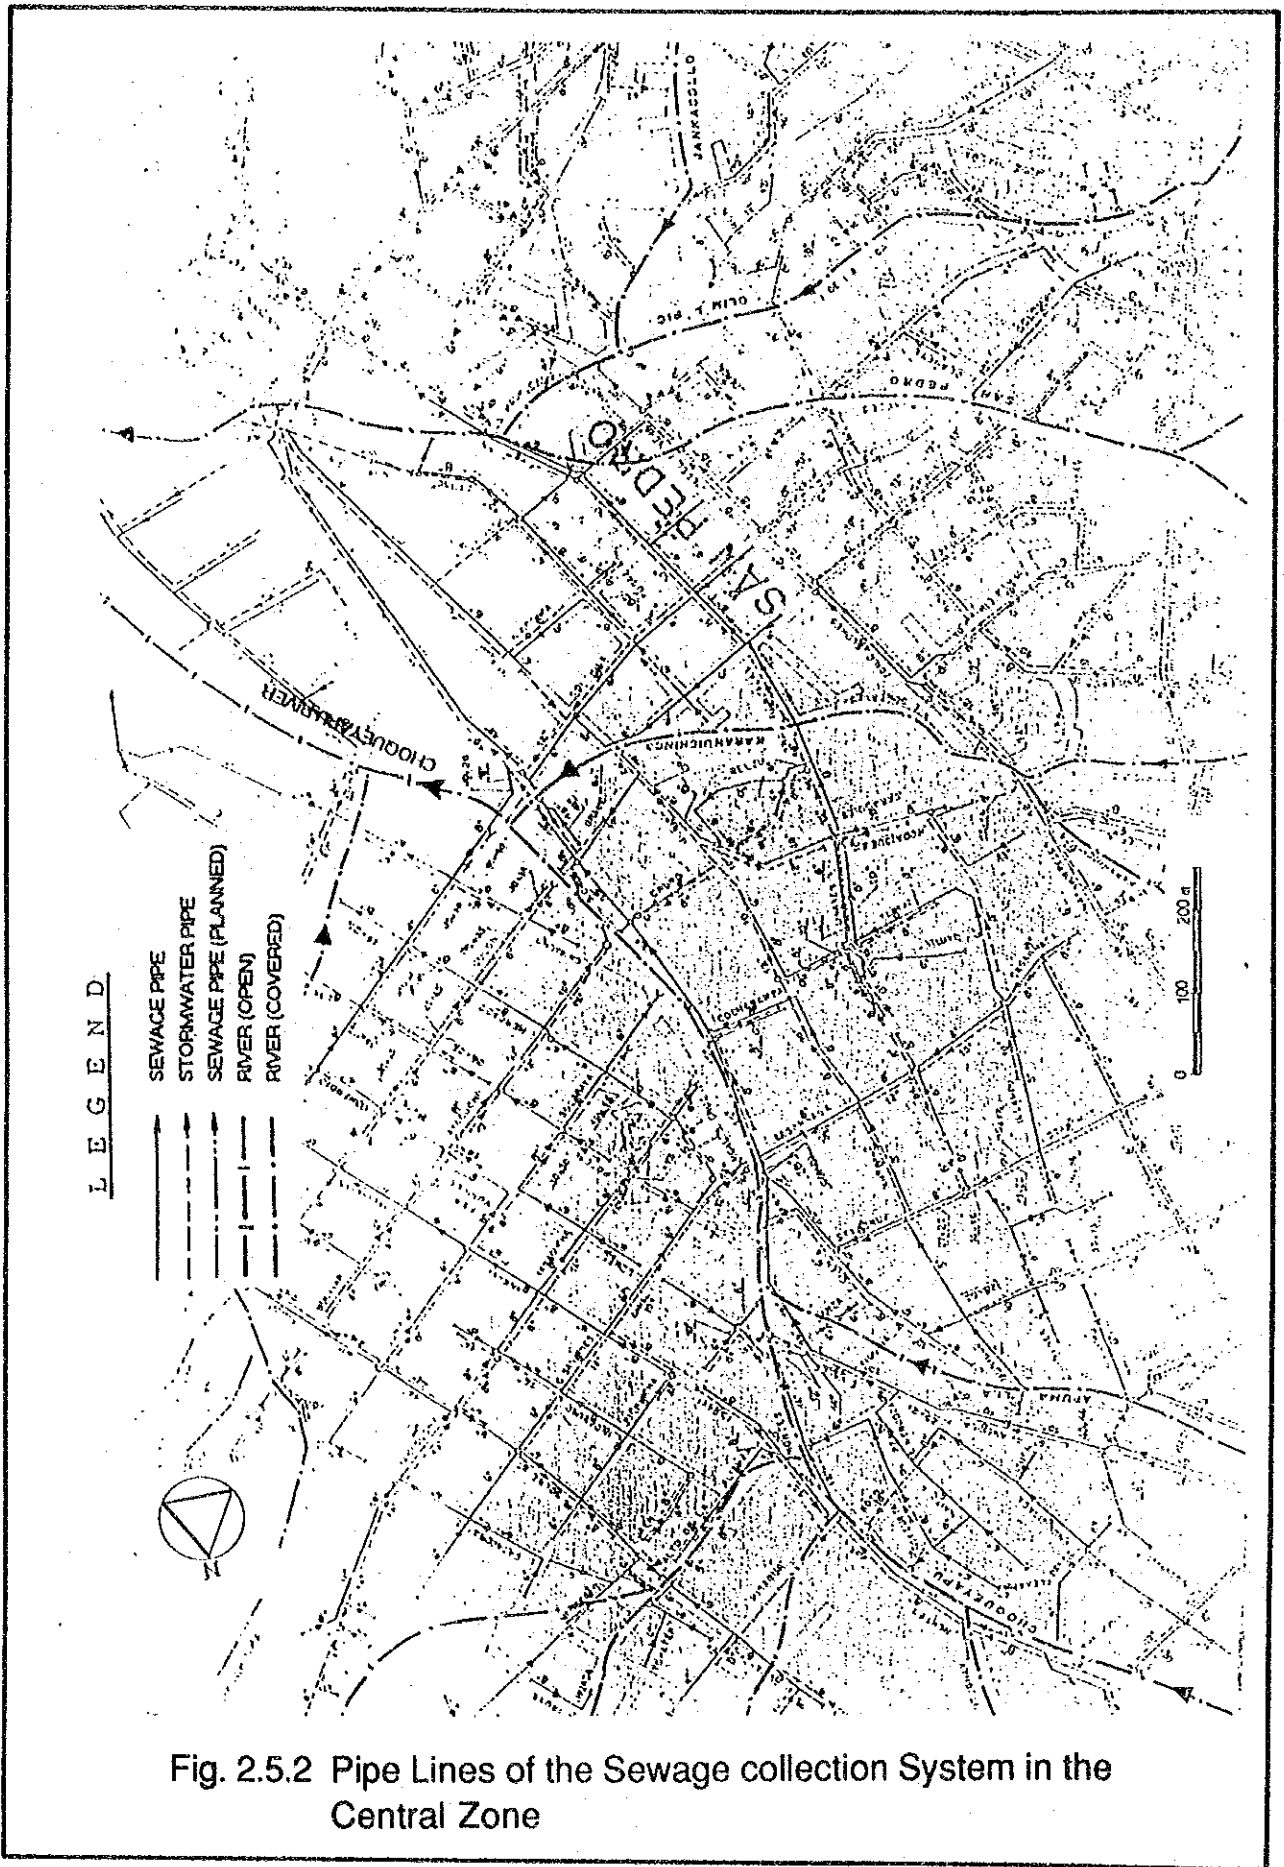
Pipe Lines of the Sewage collection System in the Central Zone
